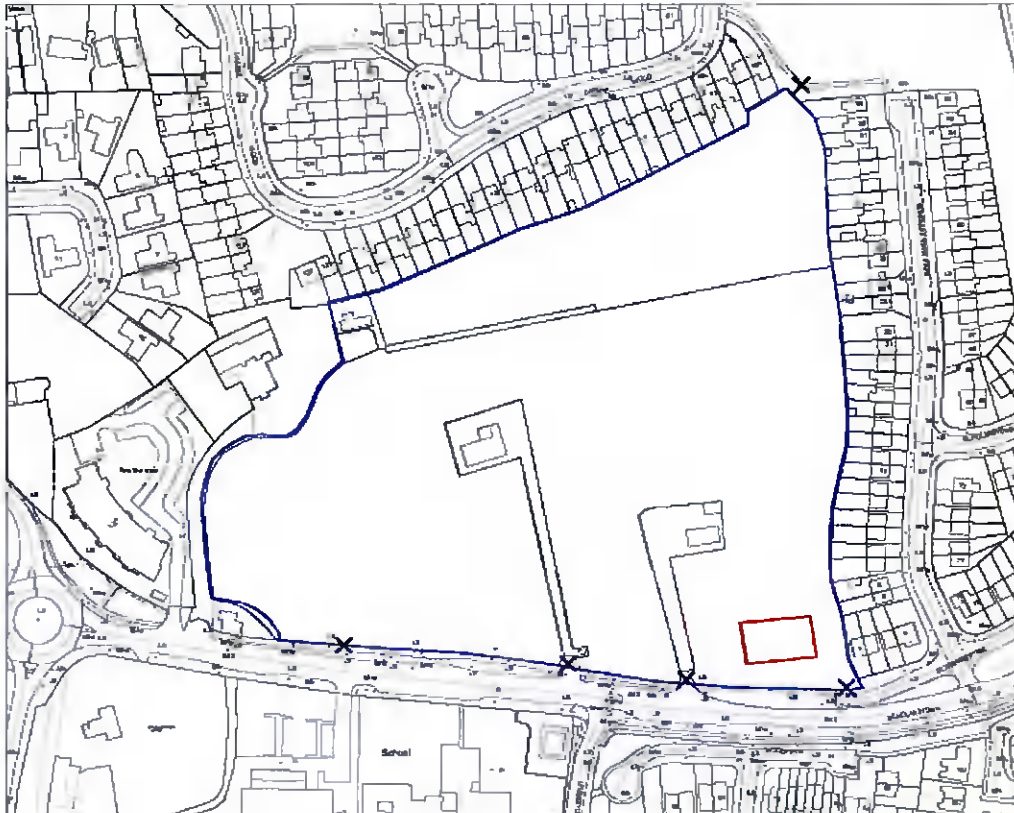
Location of Block D2 (outlined in red) towards the south-eastern corner of the site, within the larger 'Two Oaks' site (outlined in blue)
